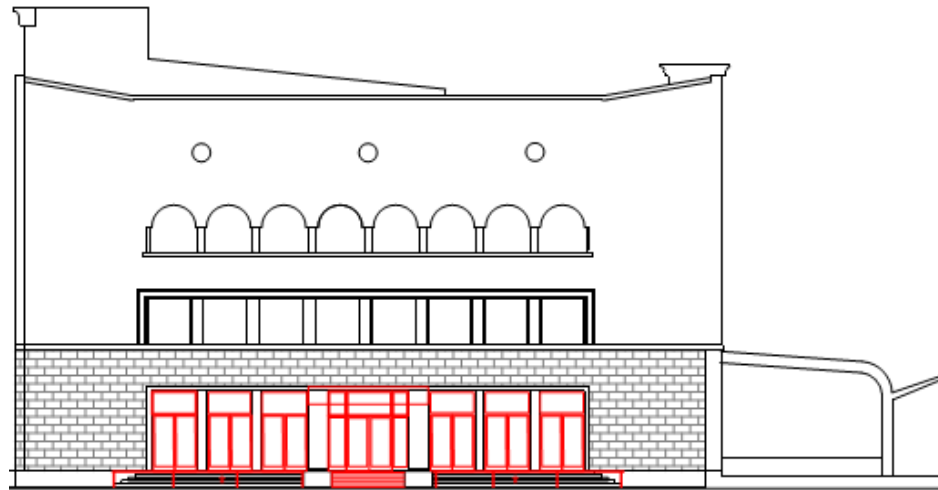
Current situation western facade (with red color are shown dismantling locations)
